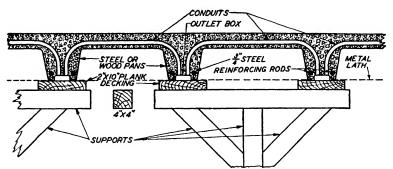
Cross Section of Installation of Outlet Box and Conduit in Concrete Slab and Floor Joist
